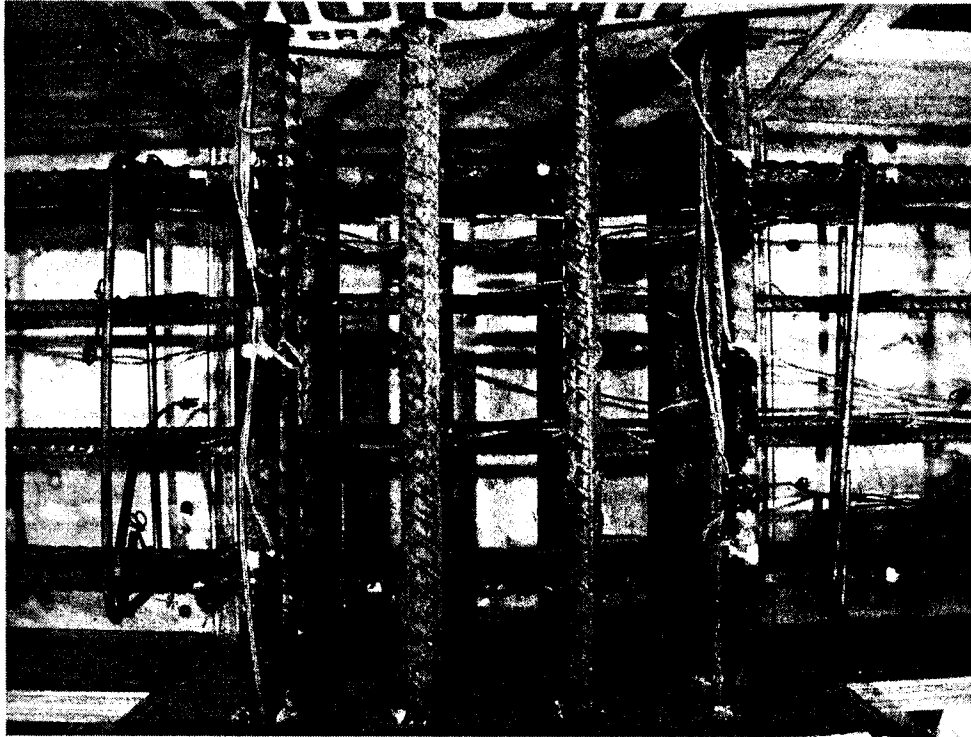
Reinforcement inside the beam-column joint; note no hoops were used (Specimen 1)
